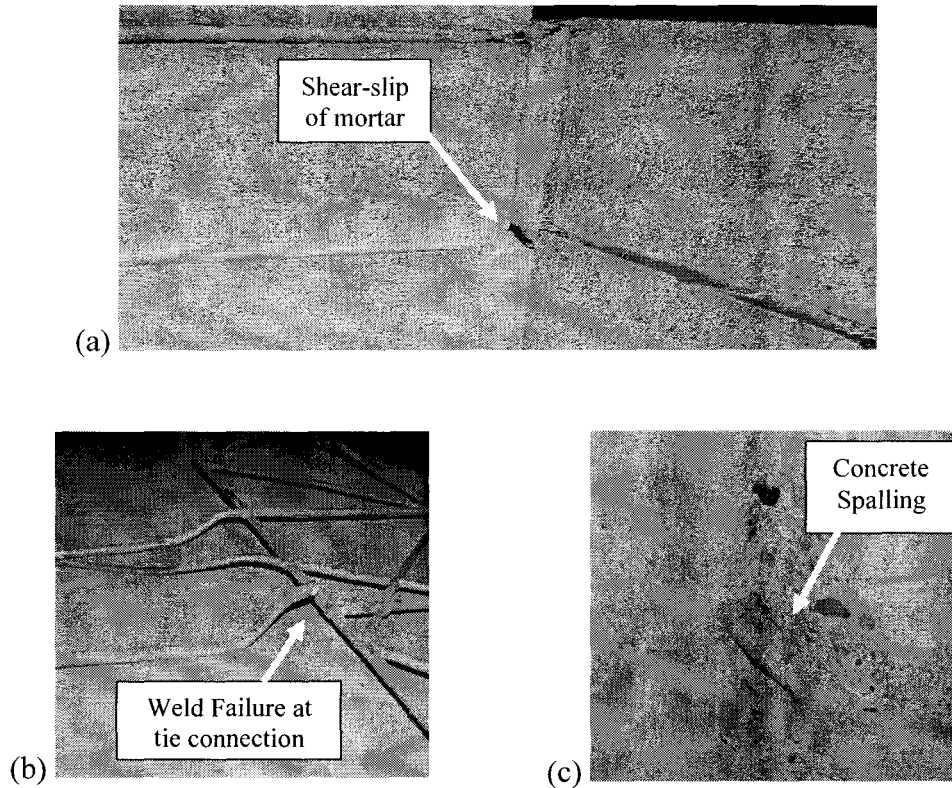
Failure modes-Series A specimens: (a) Shear slip of mortar, (b) Weld Fracture, and (c) Spalling of concrete
